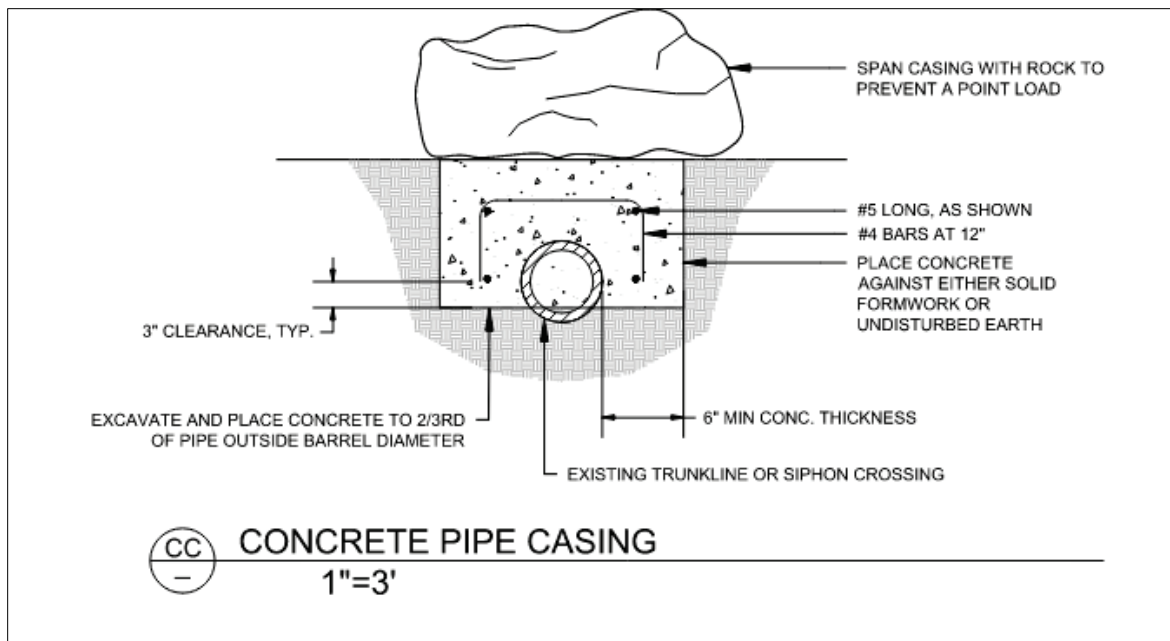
Cross sectional view of the new concrete casing to protect the trunk sewer at Kohler Creek (PCI 2022)
